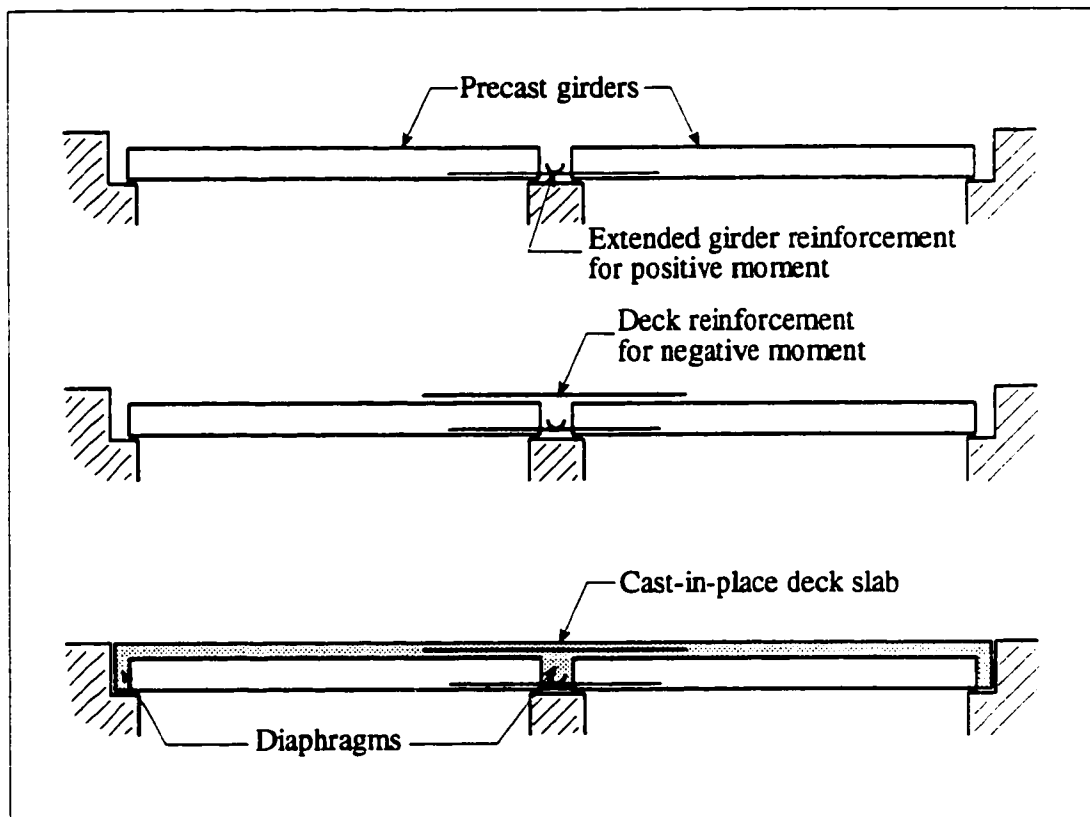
Construction sequence for a two-span bridge with precast, prestressed concrete girders made continuous
